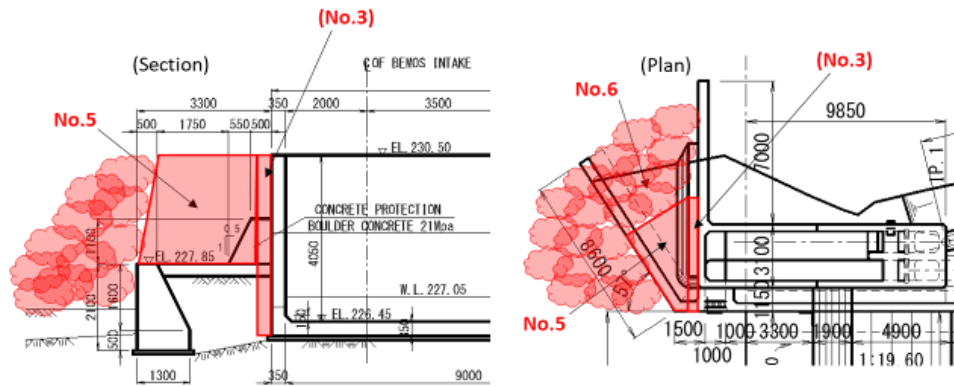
Rehabilitation Plan from No.5 to No.6
